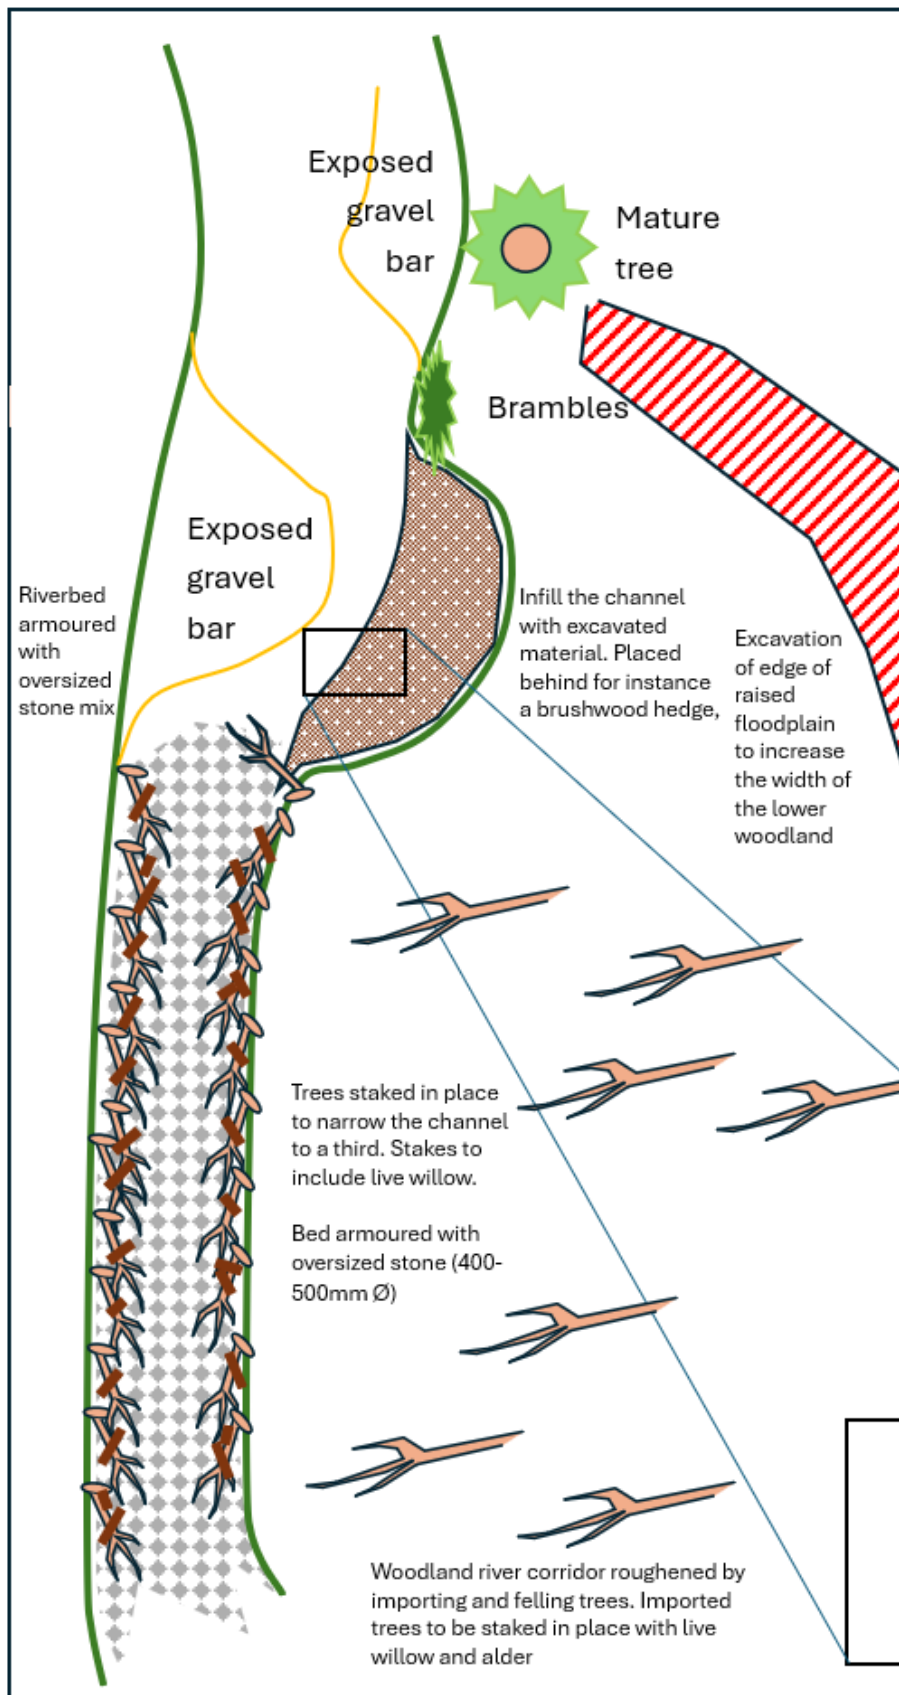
Detailed design drawing of Site 4 (river) and Site 6 (woodland).
